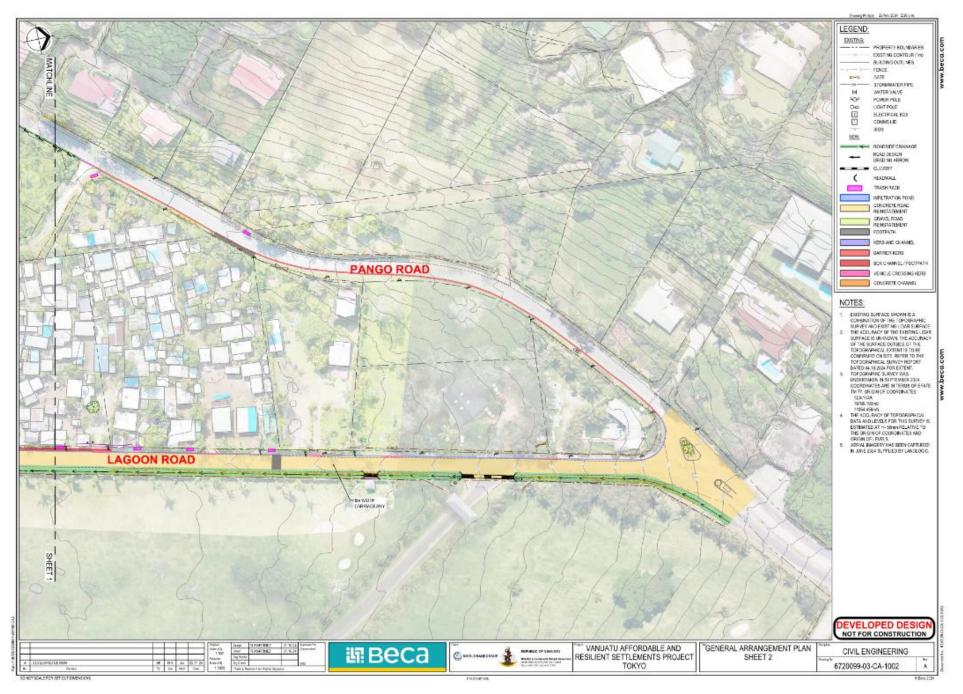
Improved roadside drainage along current drainage paths, Pango Road and Lagoon Road.
